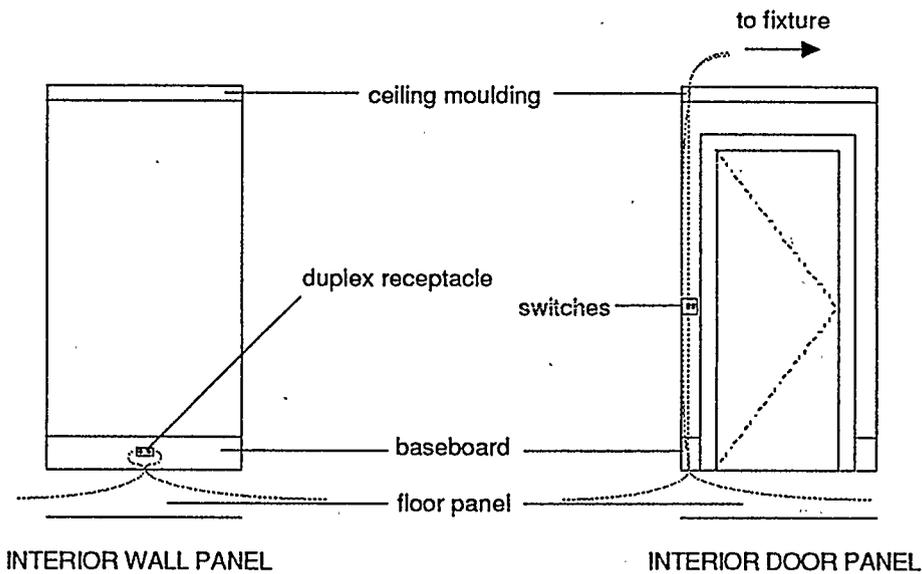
Elevations of interior wall and door panels showing electrical hook-up for receptacles and switches
